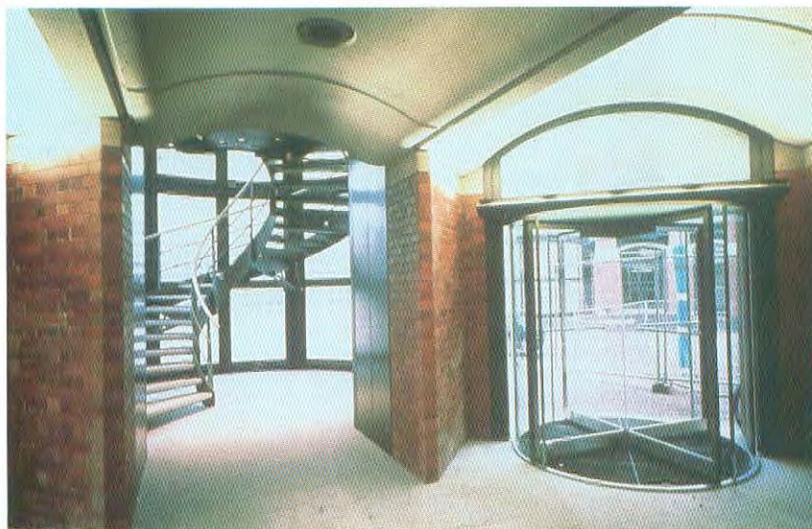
Interior view of prefabricated brick pillars and exposed precast floor units at Inland Revenue, Nottingham, UK. (Courtesy of Brick Development Association, UK)
